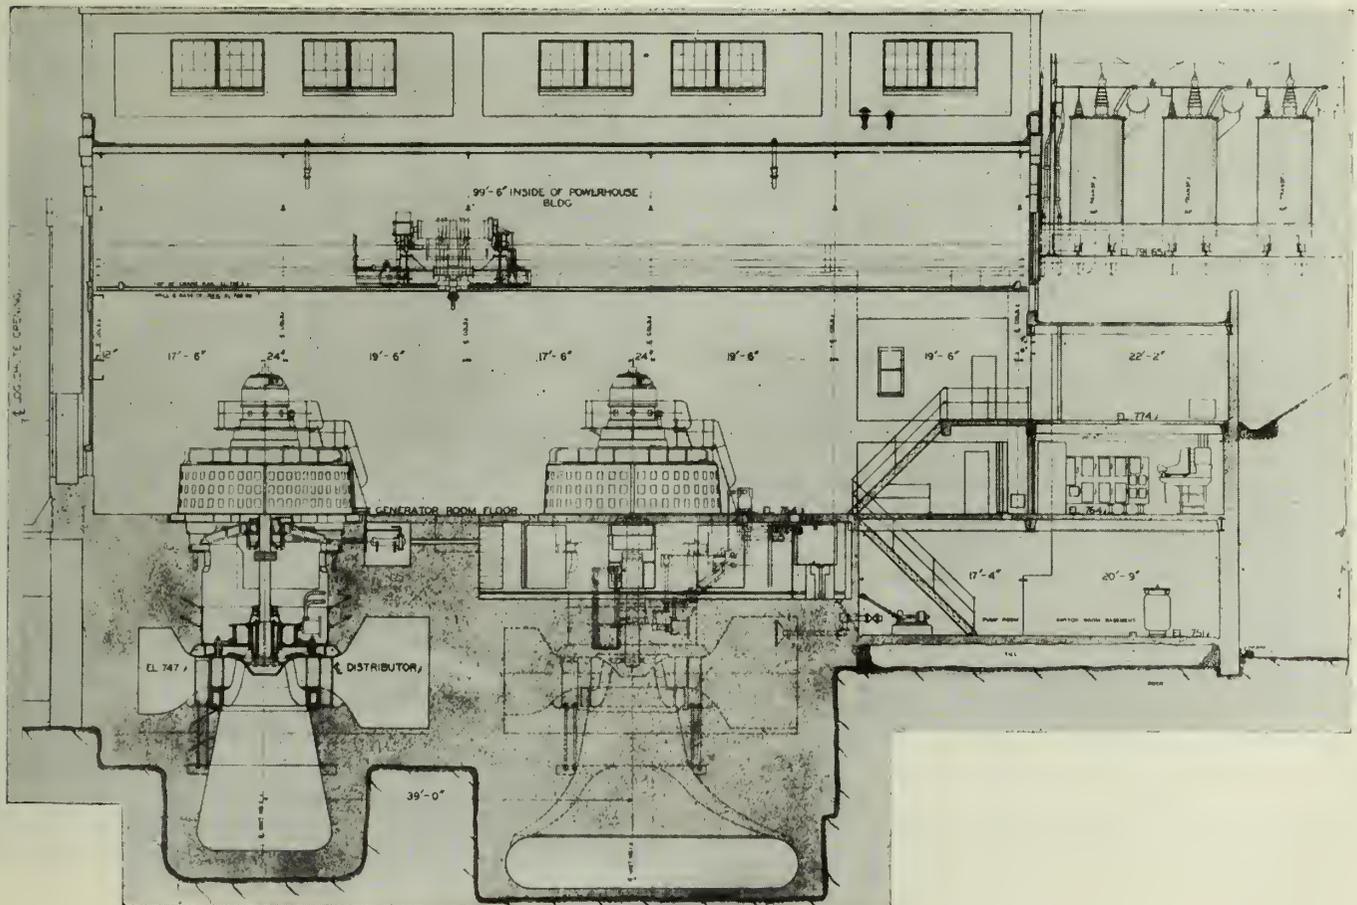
Longitudinal Section through Generator Room and Switch Room.
